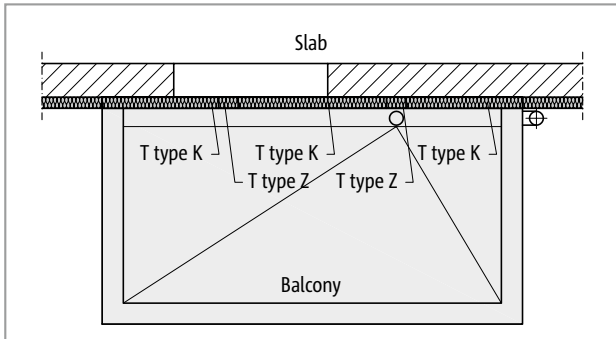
Schöck Isokorb® T type Z, K: Block-out for drainage with Schöck Isokorb® T type Z
